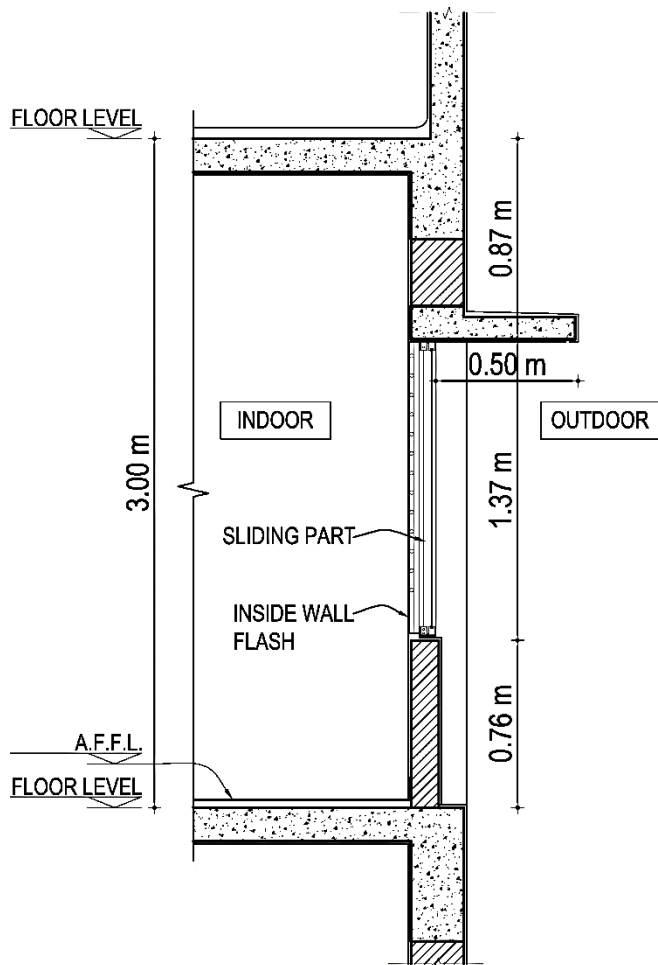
Typical Window Section of Residential Building (Not in Scale)
